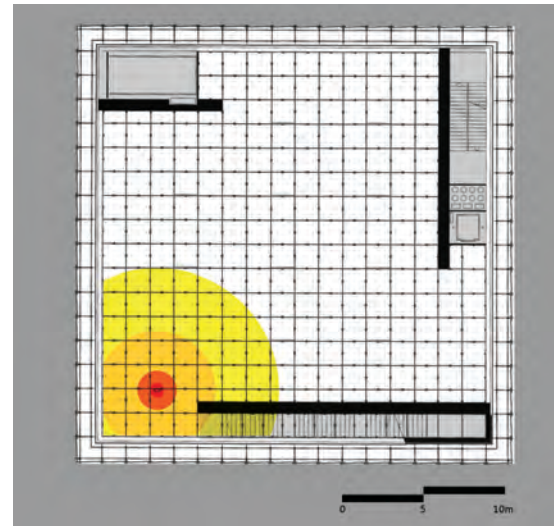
Typical floor plan of the Kunsthhaus Bregenz; revealing the structure as concrete walls.
